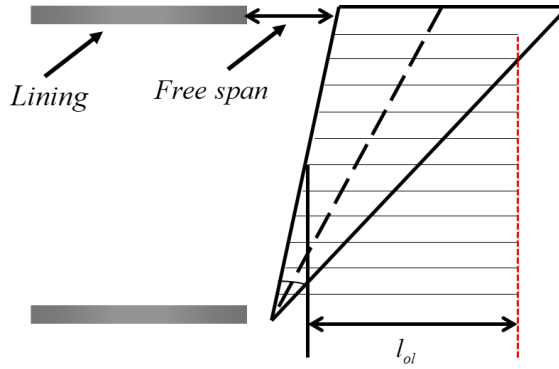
Face bolts arrangement of inclined excavation face (exit section of tunnel)
